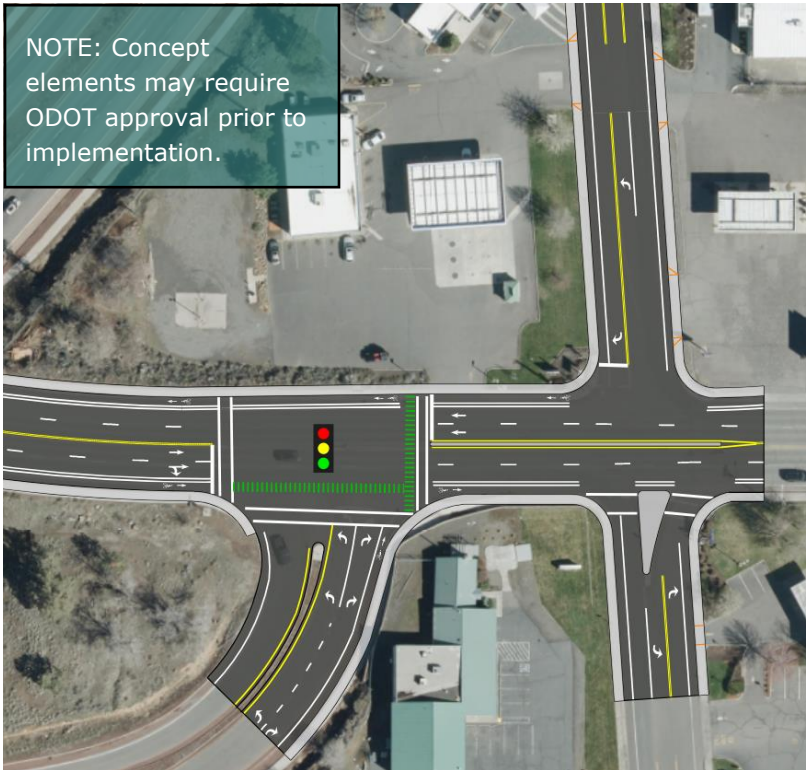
PREFERRED ALTERNATIVE AT REED MARKET ROAD/US 97 NORTHBOUND RAMP/DIVISION STREET
